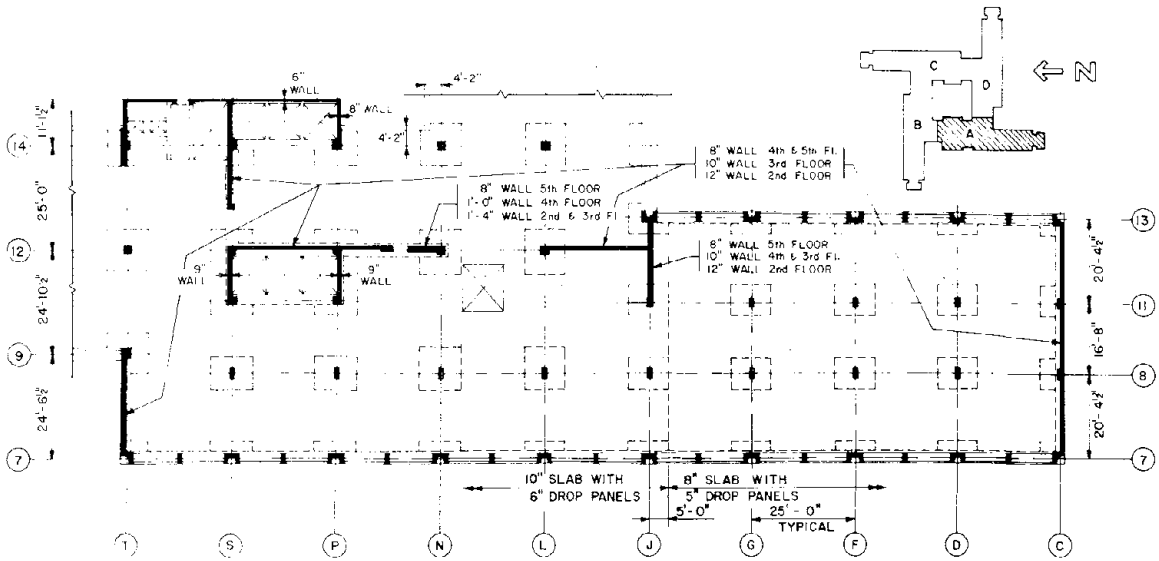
DETAIL OF WING A FLOOR PLAN FOR TYPICAL UPPER STORY (WING C SIMILAR)
